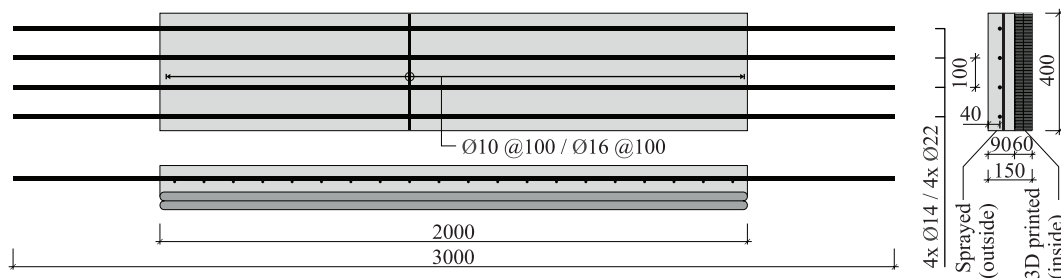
Nominal geometry and reinforcement layout of the specimens. The cross-sections are particularised for the straight printing pattern. (dimensions in [mm]).
